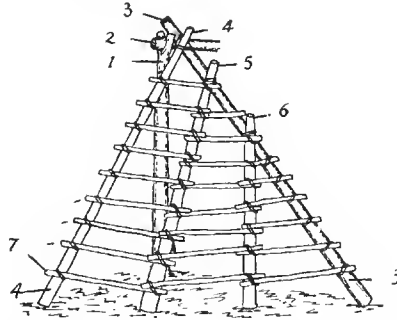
Scaffolding of rounded end section: right half viewed from outside opposite its middle. The forked supporting post (*to'o manga*) (1) of the other scaffolding, supports the crossbar (2) against which the oblique timber (3) rests. The new elements are 3 oblique heavy pieces of timber which are leaned against the upper part of (3). Of these, the longest (4) is placed slightly to the right of the middle long axis of the house with the upper end resting on the old oblique timber (3) close to the supporting post (1). The lower end rests on the ground beyond the projected line of the wall posts. The other two timbers (5 and 6) have their lower ends placed on the ground beyond the wall post line so as evenly to divide the space while the upper ends are tied to the oblique timber (3). The oblique timbers, like the ones in the middle section, are *fata sasau* or *fata vala*. The cross pieces, also called *teleteleanga* or *papani* (7) are tied on in the usual manner.
